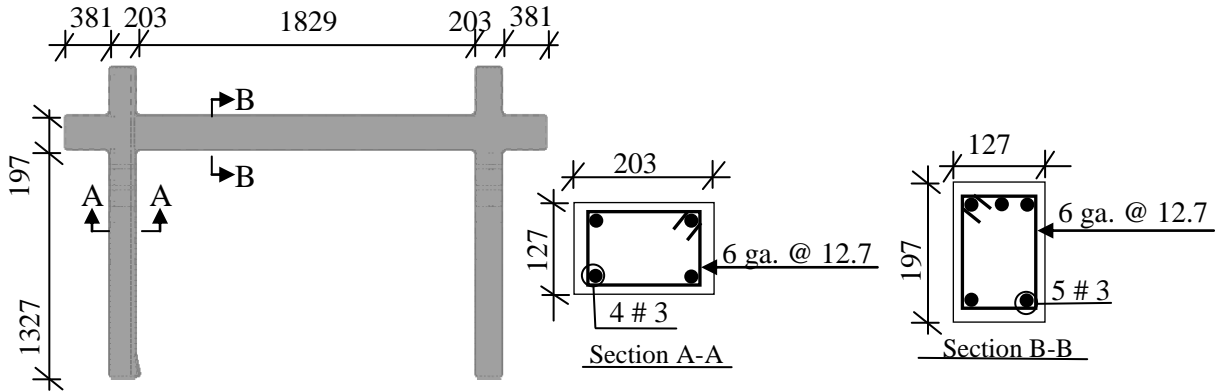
Bare frame geometry and reinforcement details (Al-Chaar et al., 2002). All dimensions in mm.
